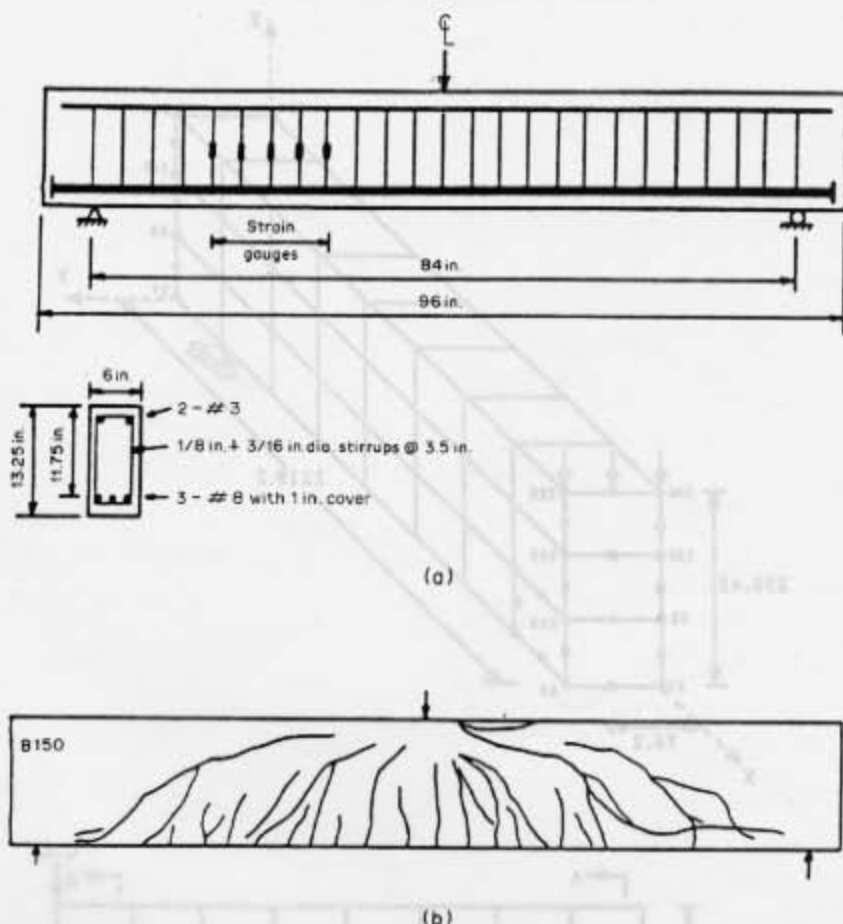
Beam B150-11-3 [15]: (a) dimensions and reinforcement detailing; (b) typical crack pattern after failure.
